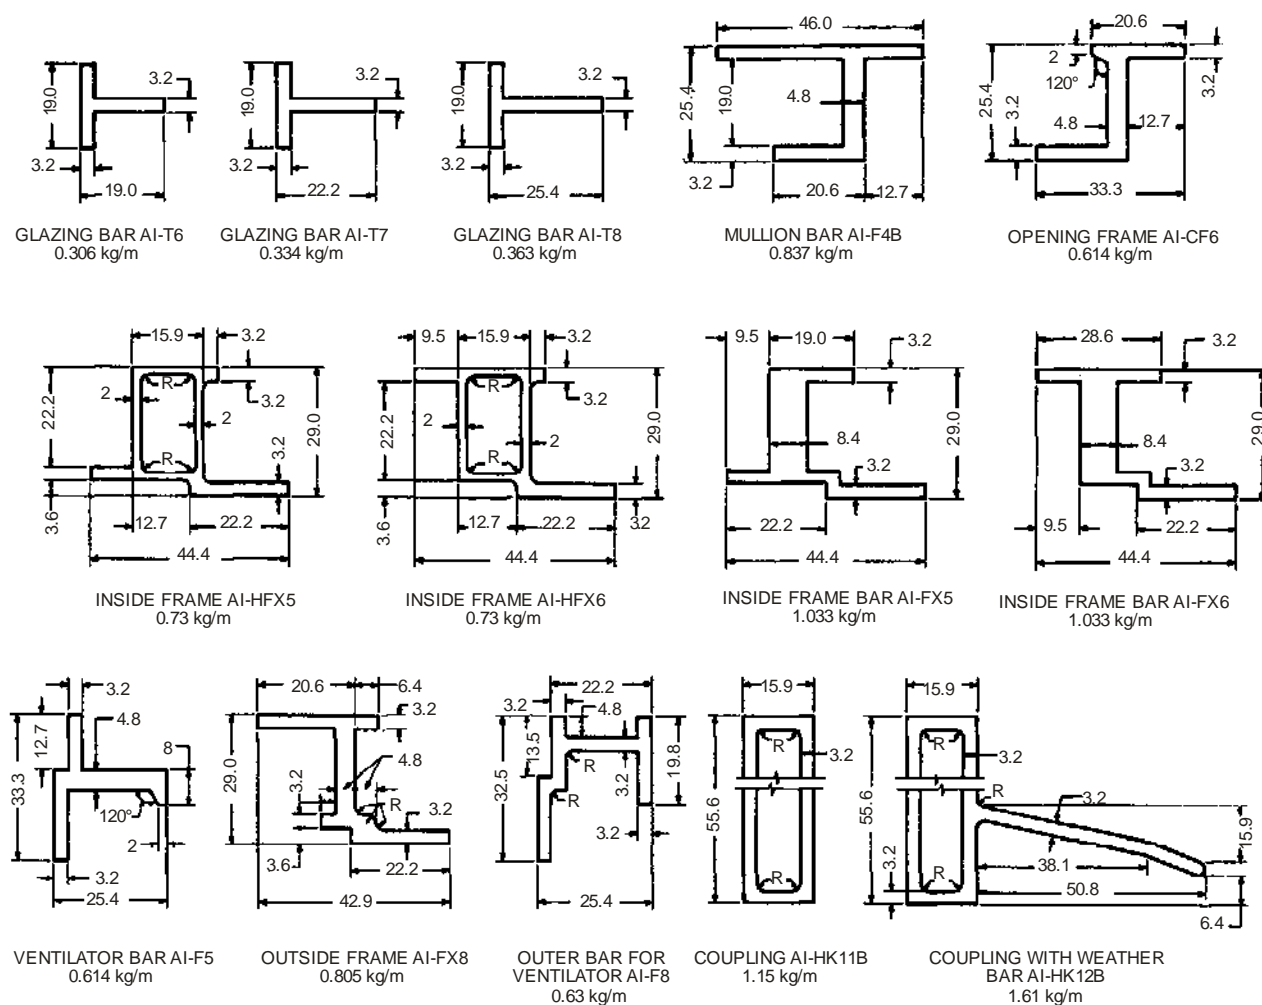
Types and Size of Aluminium Doors, Windows and Ventilators
